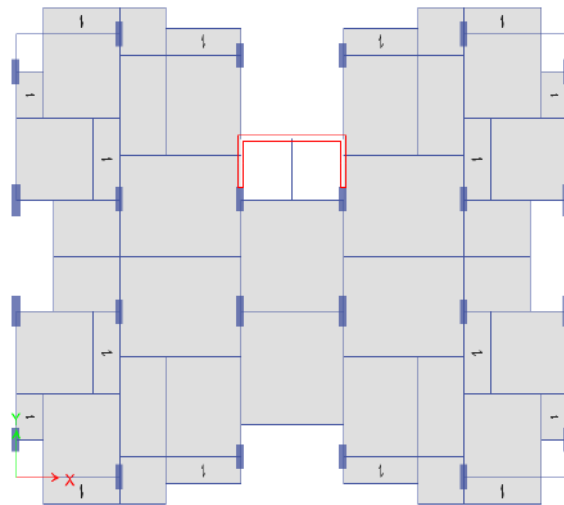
Parking Floor (Ground floor slab) level of Model-2
